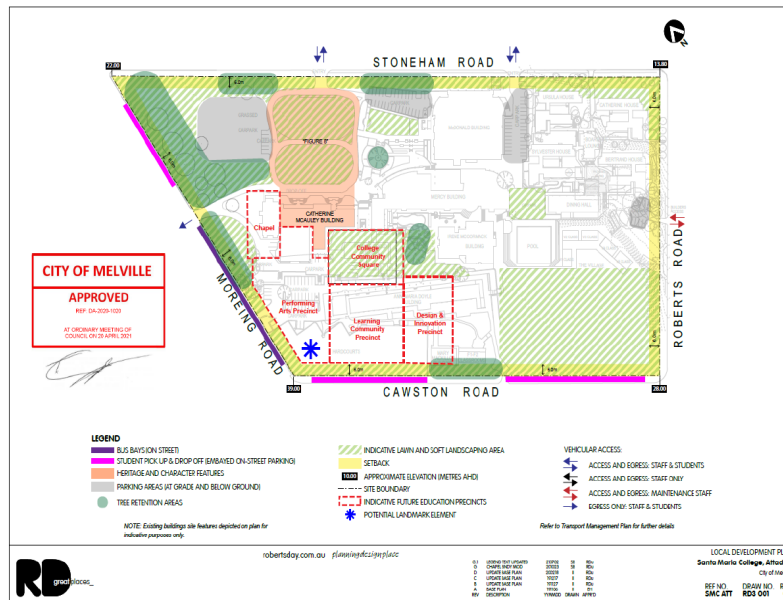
Approved Local Development Plan for Santa Maria Catholic College
